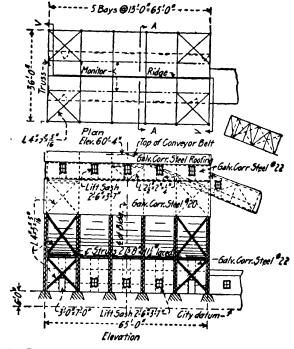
COAL BUNKERS, RAPID TRANSIT SUBWAY, NEW YORK, N. Y.
